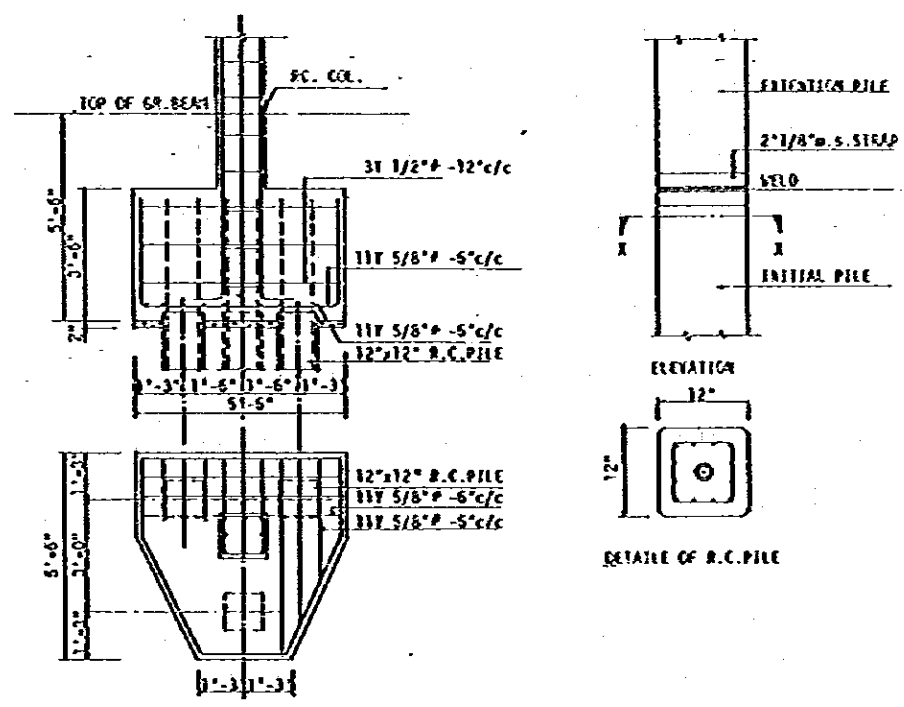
Details of R.C. Pile Cap (After PWD Standard Drawings)
